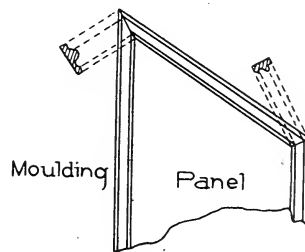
Panel in Spandrel, Showing Miter on Moulding, and Shape of Section.
